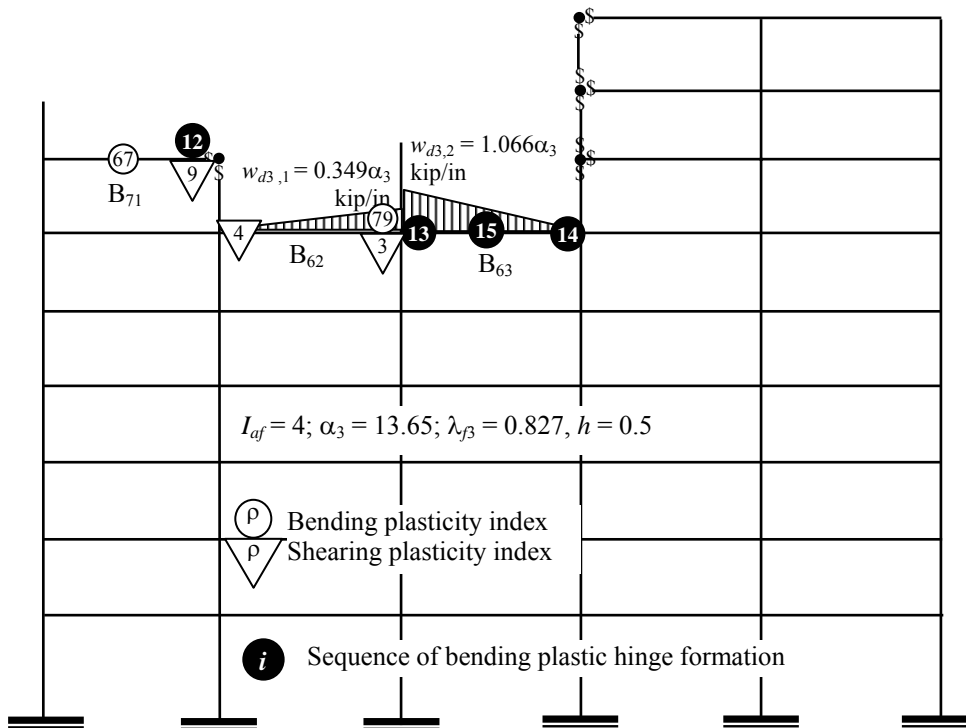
Example 5 (Boston): Beam B₇₃ falls as debris loading and fails beam B₆₃ (Stage 3)
